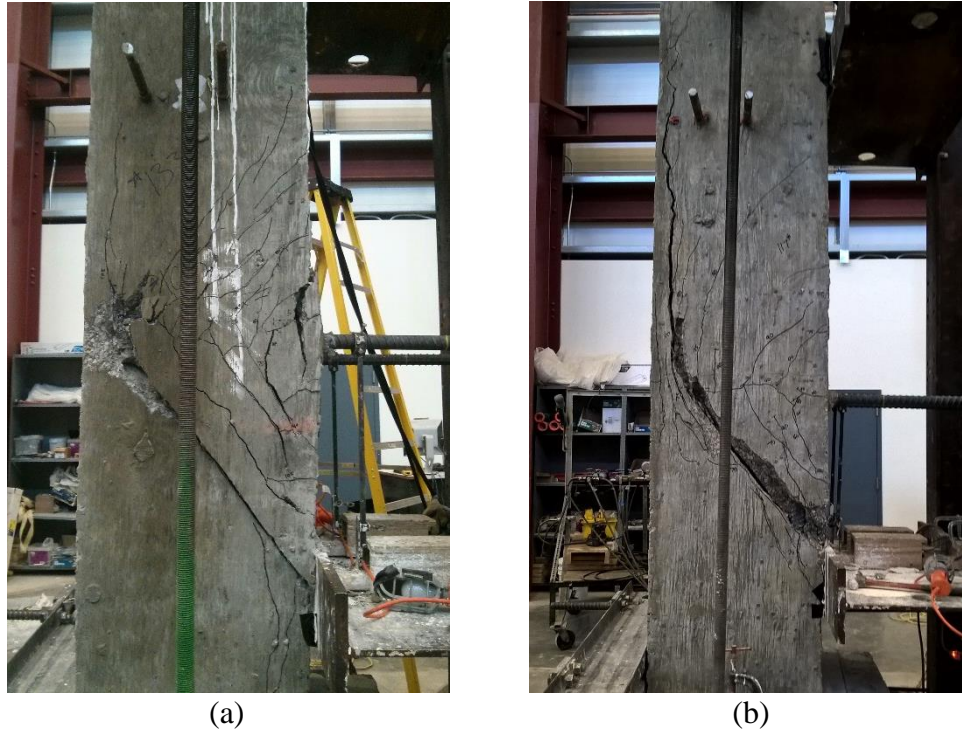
Two types of breakout failure (a) cone-shaped (b) back cover splitting
